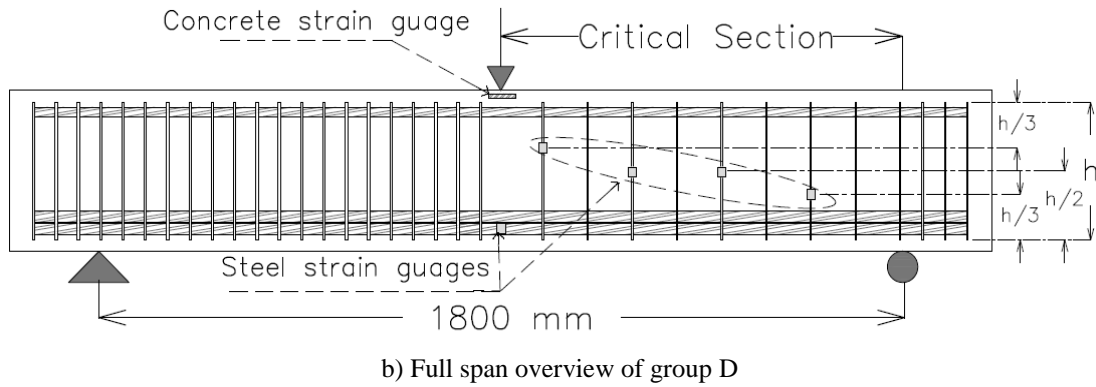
Locations of strain gauges on steel reinforcement and concrete surface (continued)
